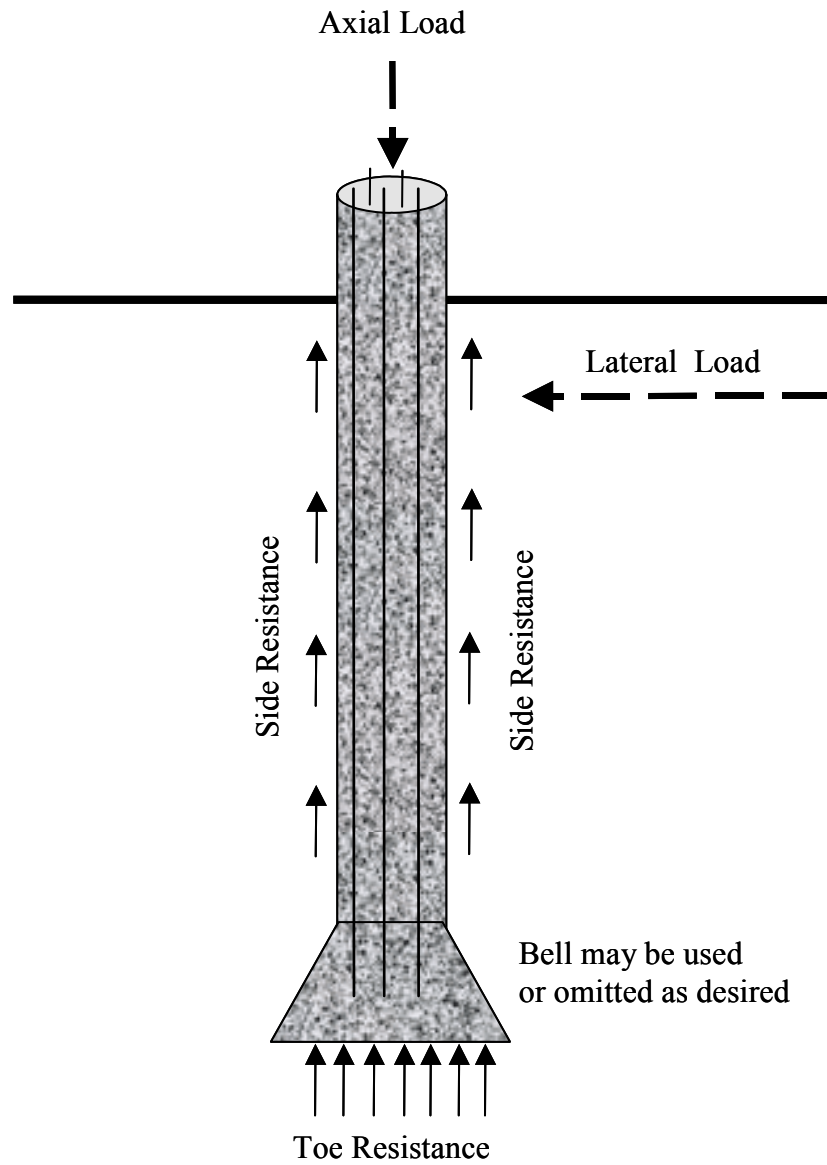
Schematic Diagram of a Typical Drilled Shaft Foundation.
